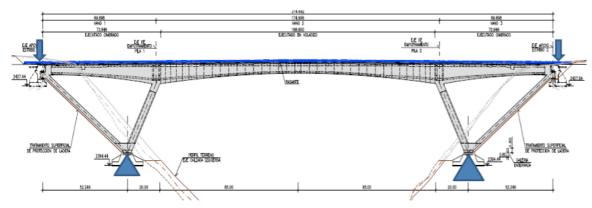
SECTIONAL VIEW OF THE CHICHE BRIDGE
